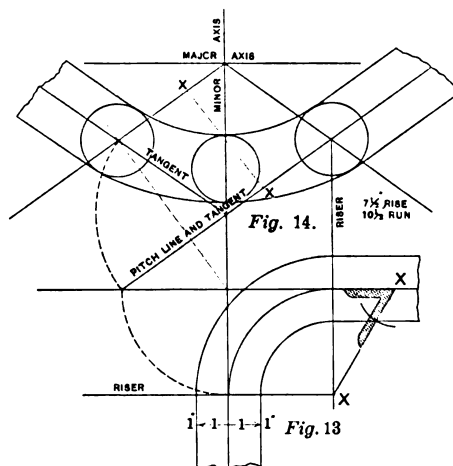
Plan of Platform Stairs with the Width of Rail shown at 11.
